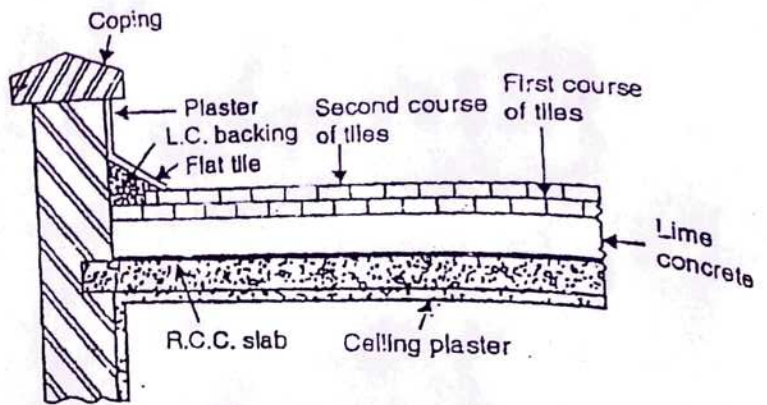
LIME CONCRETE AND TILES ROOFING.
